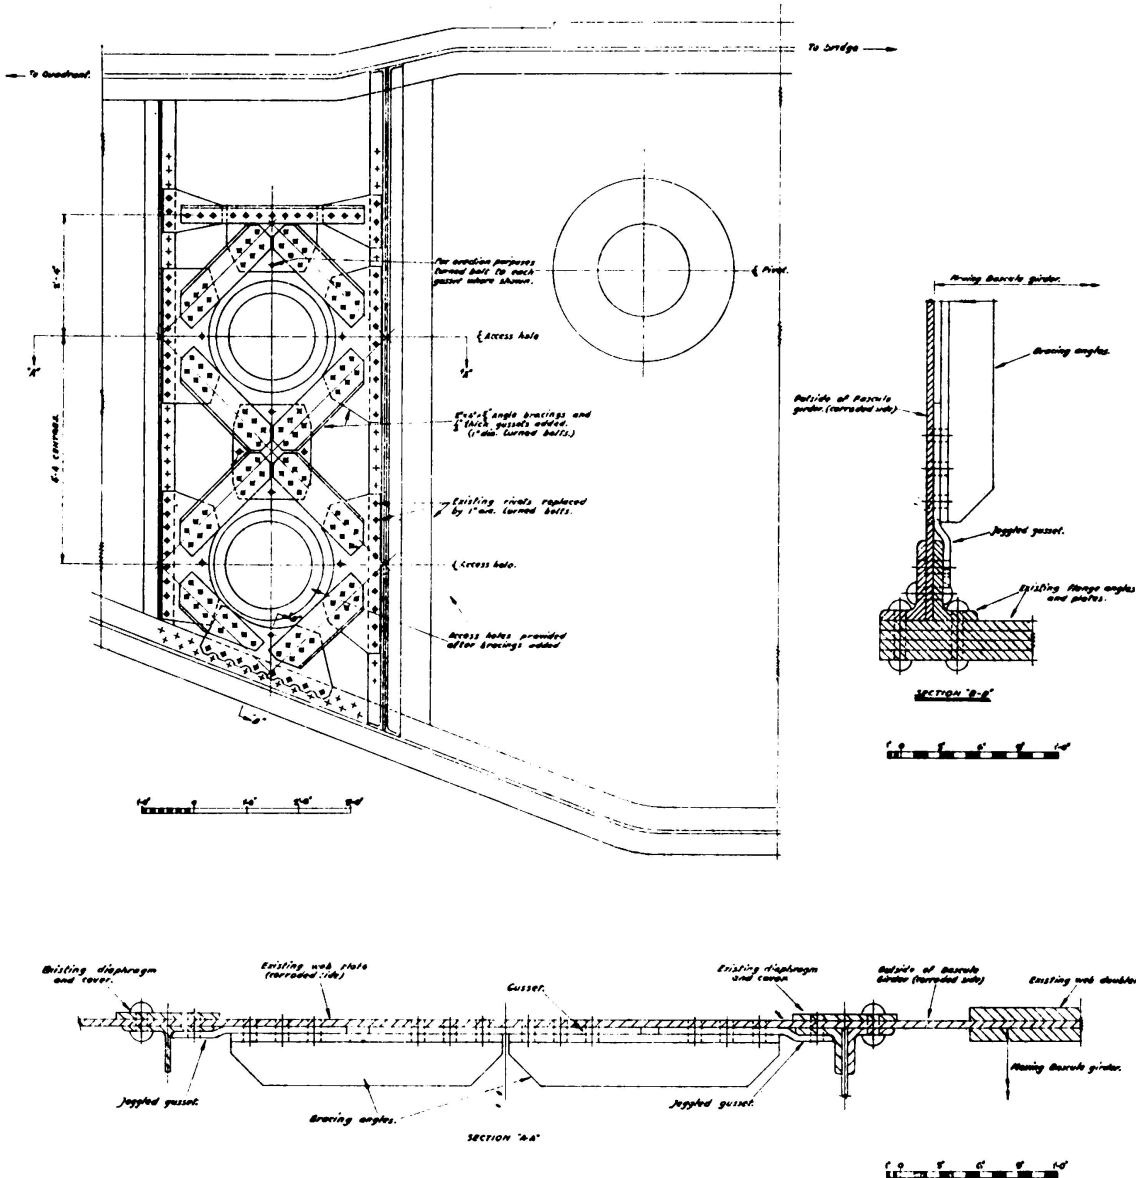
Tower Bridge repairs. Arrangement of new steelwork for repair of corroded webs of moving bascule girders
